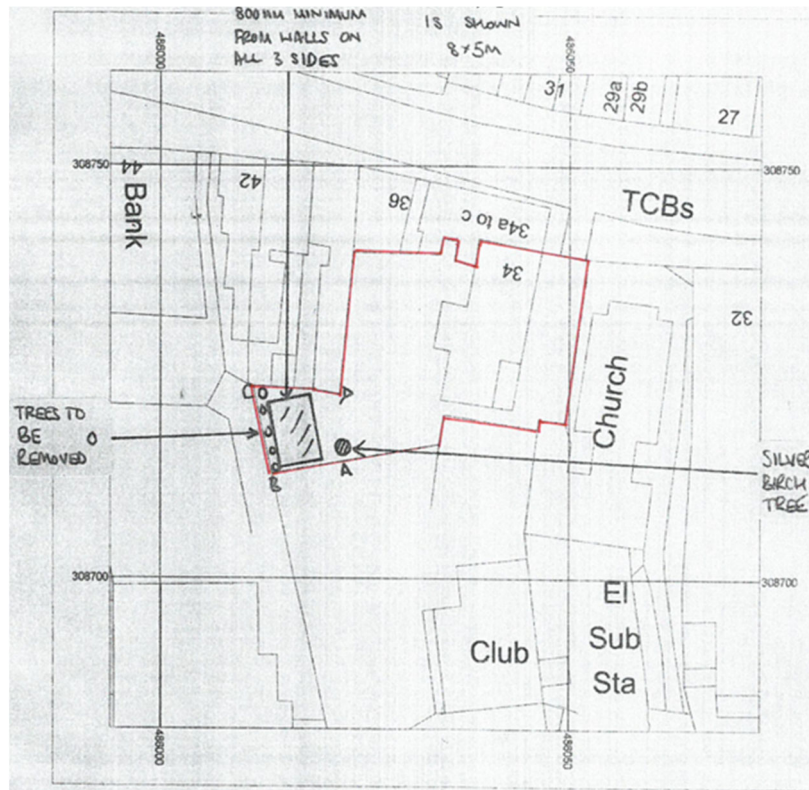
Location of proposed building shown within the house grounds (provided by client).
